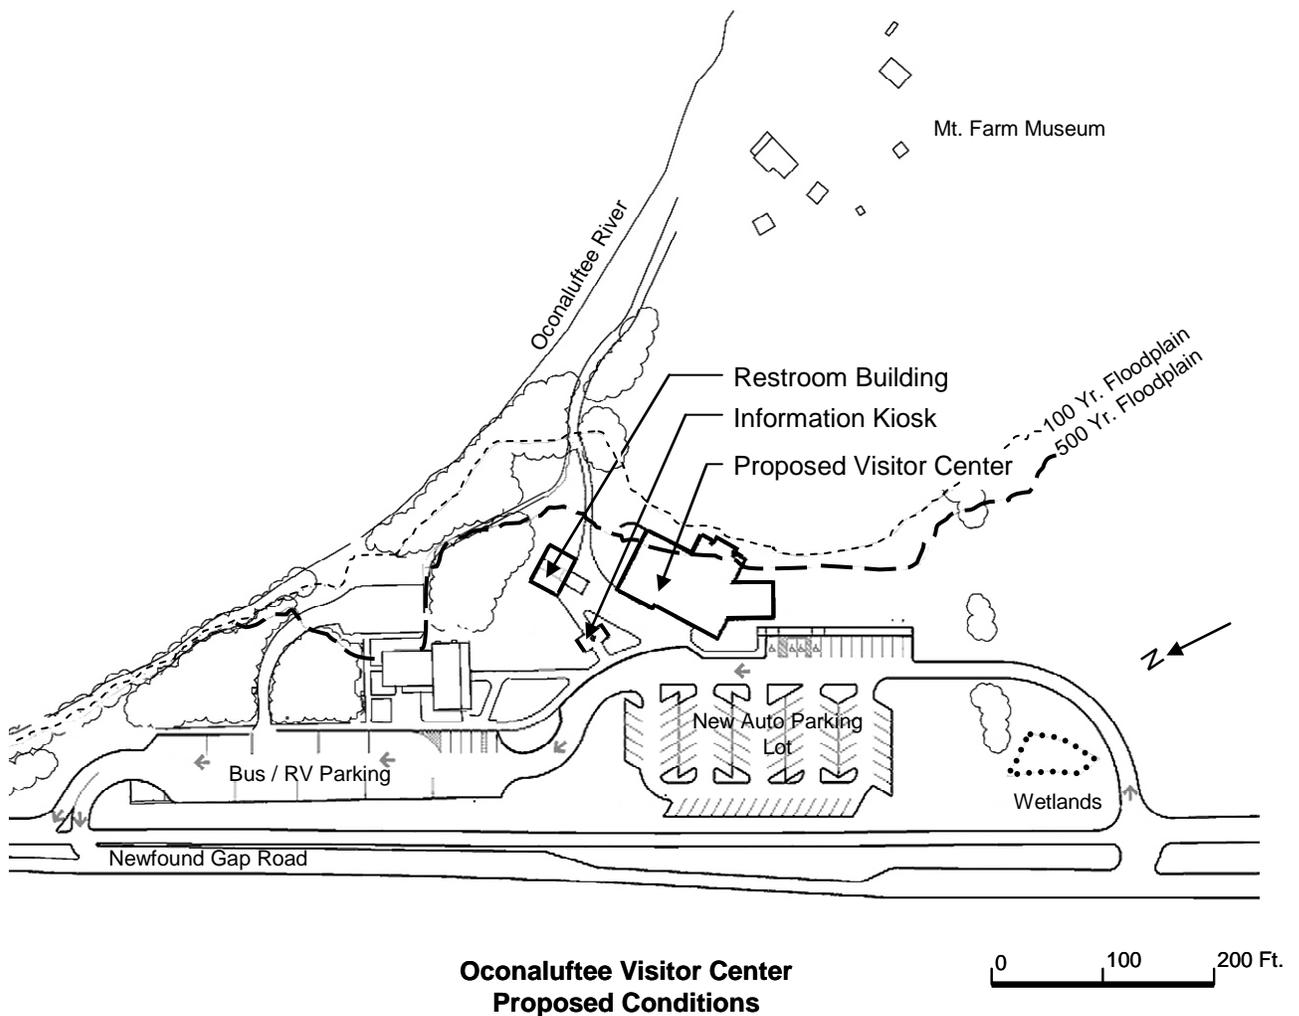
Proposed Conditions (building configuration and placement are approximate)
